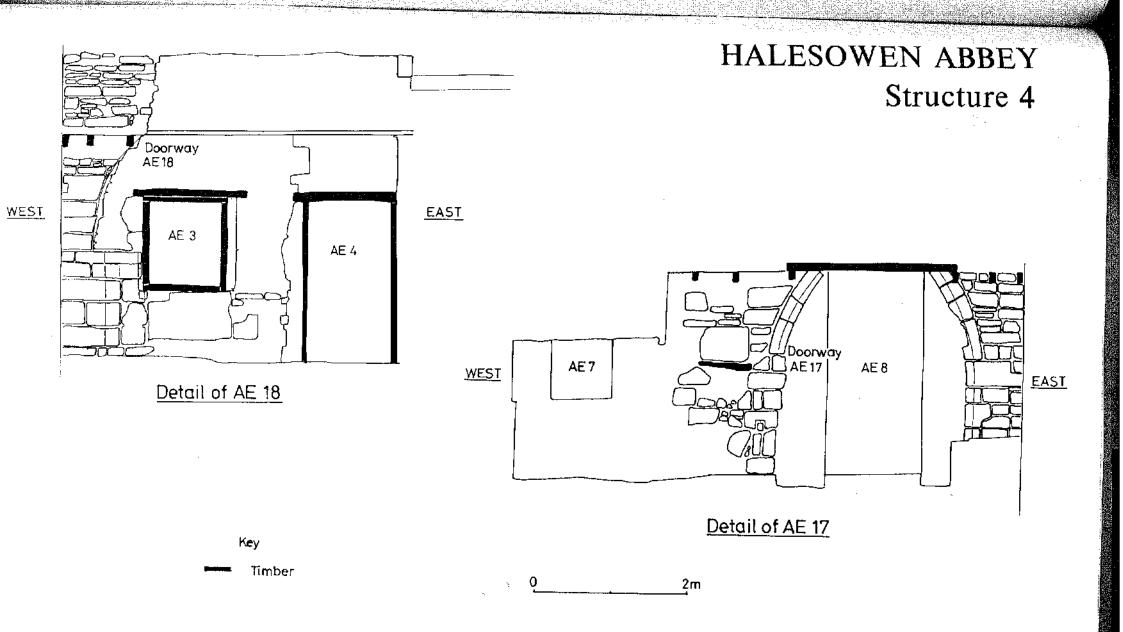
Structure 4. Details of Medieval Doorways, Interior Face of North Wall. (Hooper, after Sterenberg)
